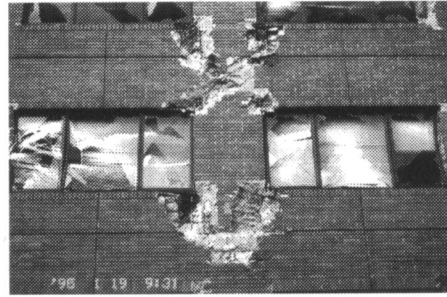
Cross diagonal compression cracks on the interior joint of 11-story SRC building
